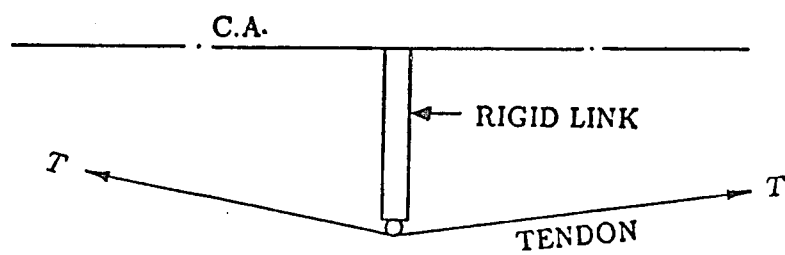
Model of Prestressed Composite Girder with Draped Continuous Tendon
